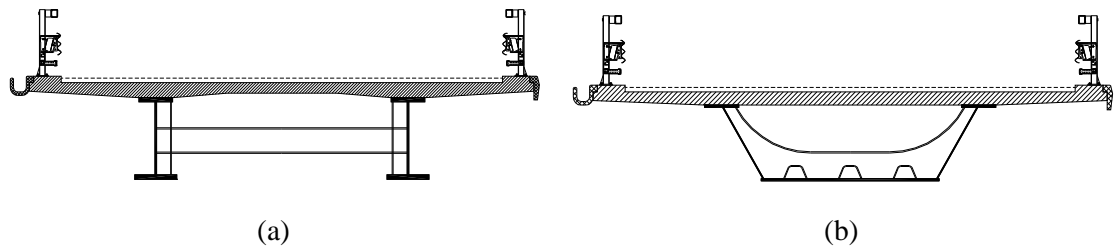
Composite bridges: (a) two parallel steel beams, (b) box girder.
